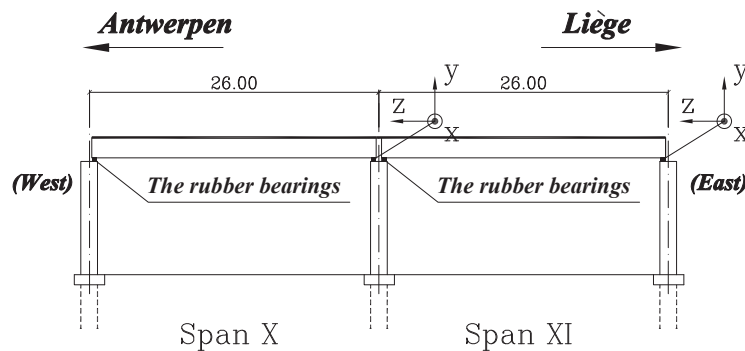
Elevation view of Span X and Span XI (units in meter). Note: the two adjacent Spans were of identical design.
